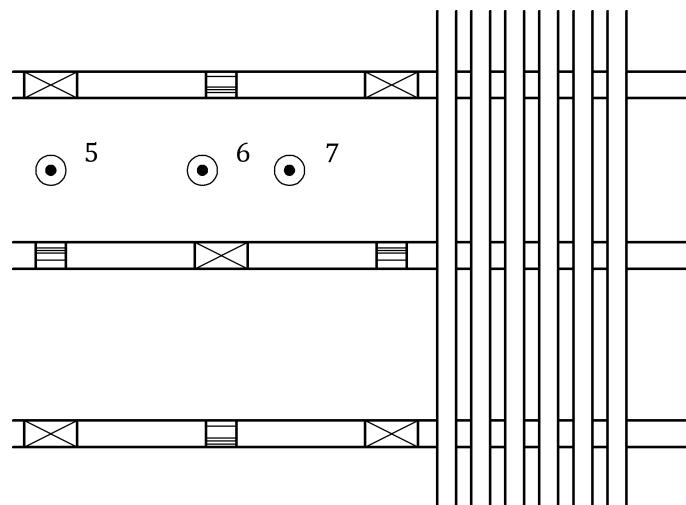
Area-elastic sports floor with elastic construction (beam, consisting of two parallel one upon another battens, support non-staggered)
